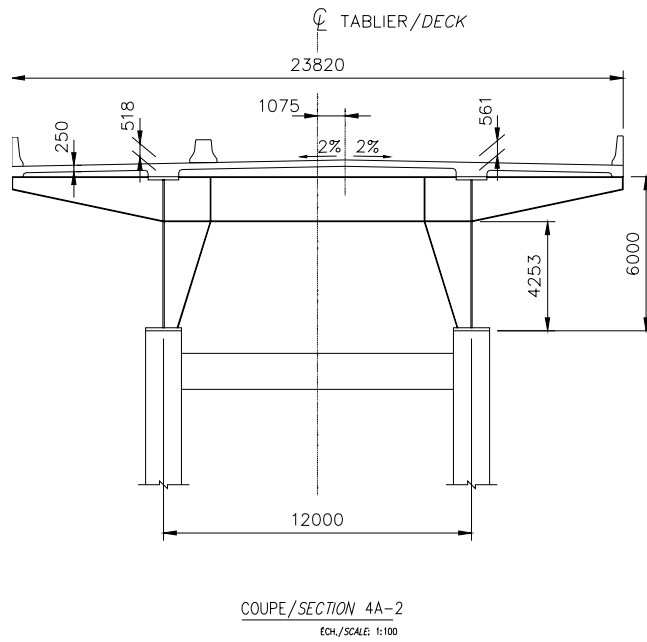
Cross-section – Mixed frame bridge with V-shaped piers – Double box girder
